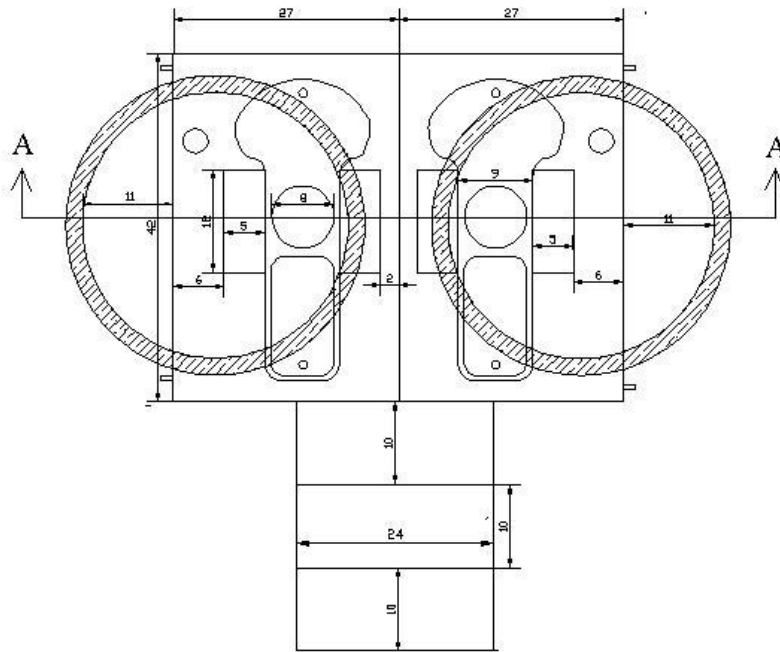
Plan of UDD toilet (all dimensions are in inch)
